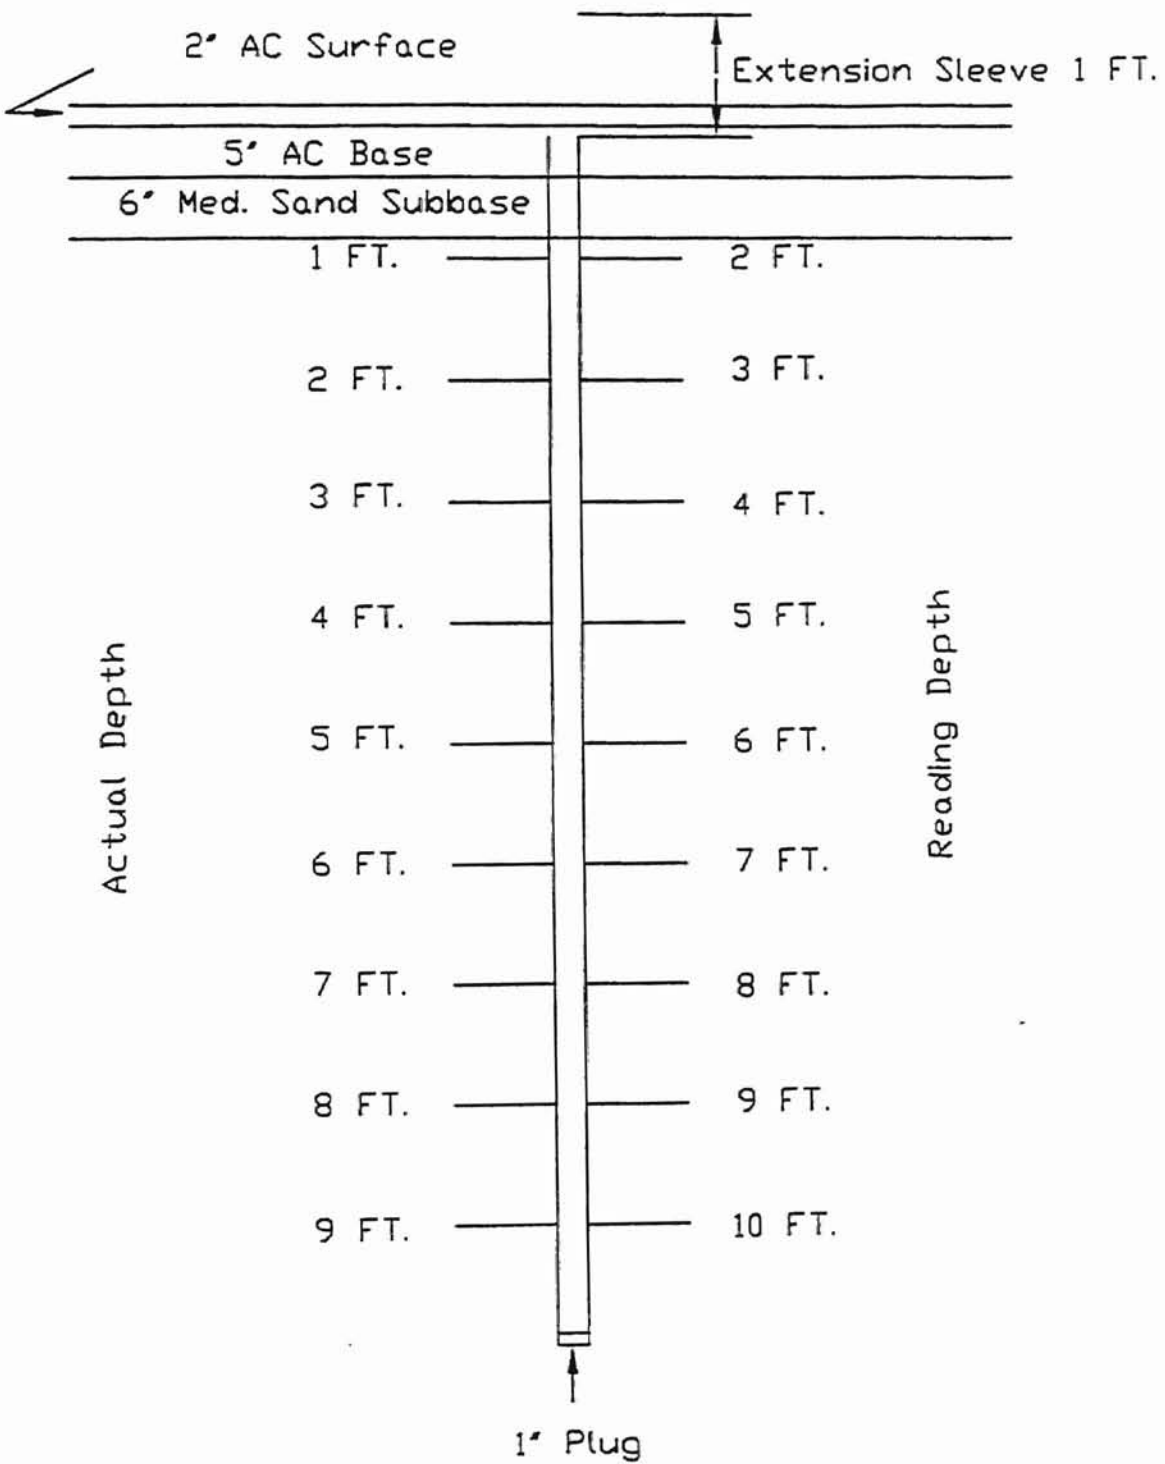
Actual Depth and Tube Depth, Boring T2
